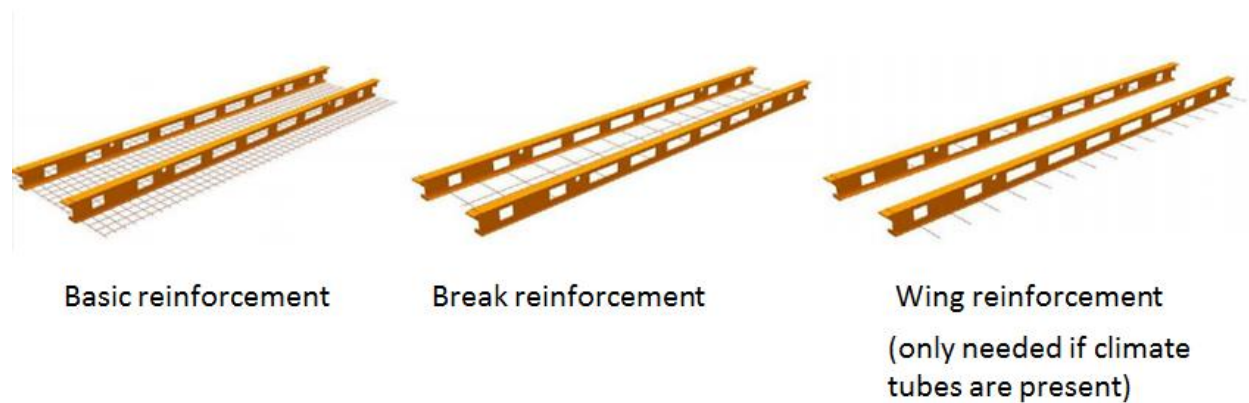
Slimline Floor Framing System Mesh Reinforcement Details ("Slimline Buildings Construction," 2014)
